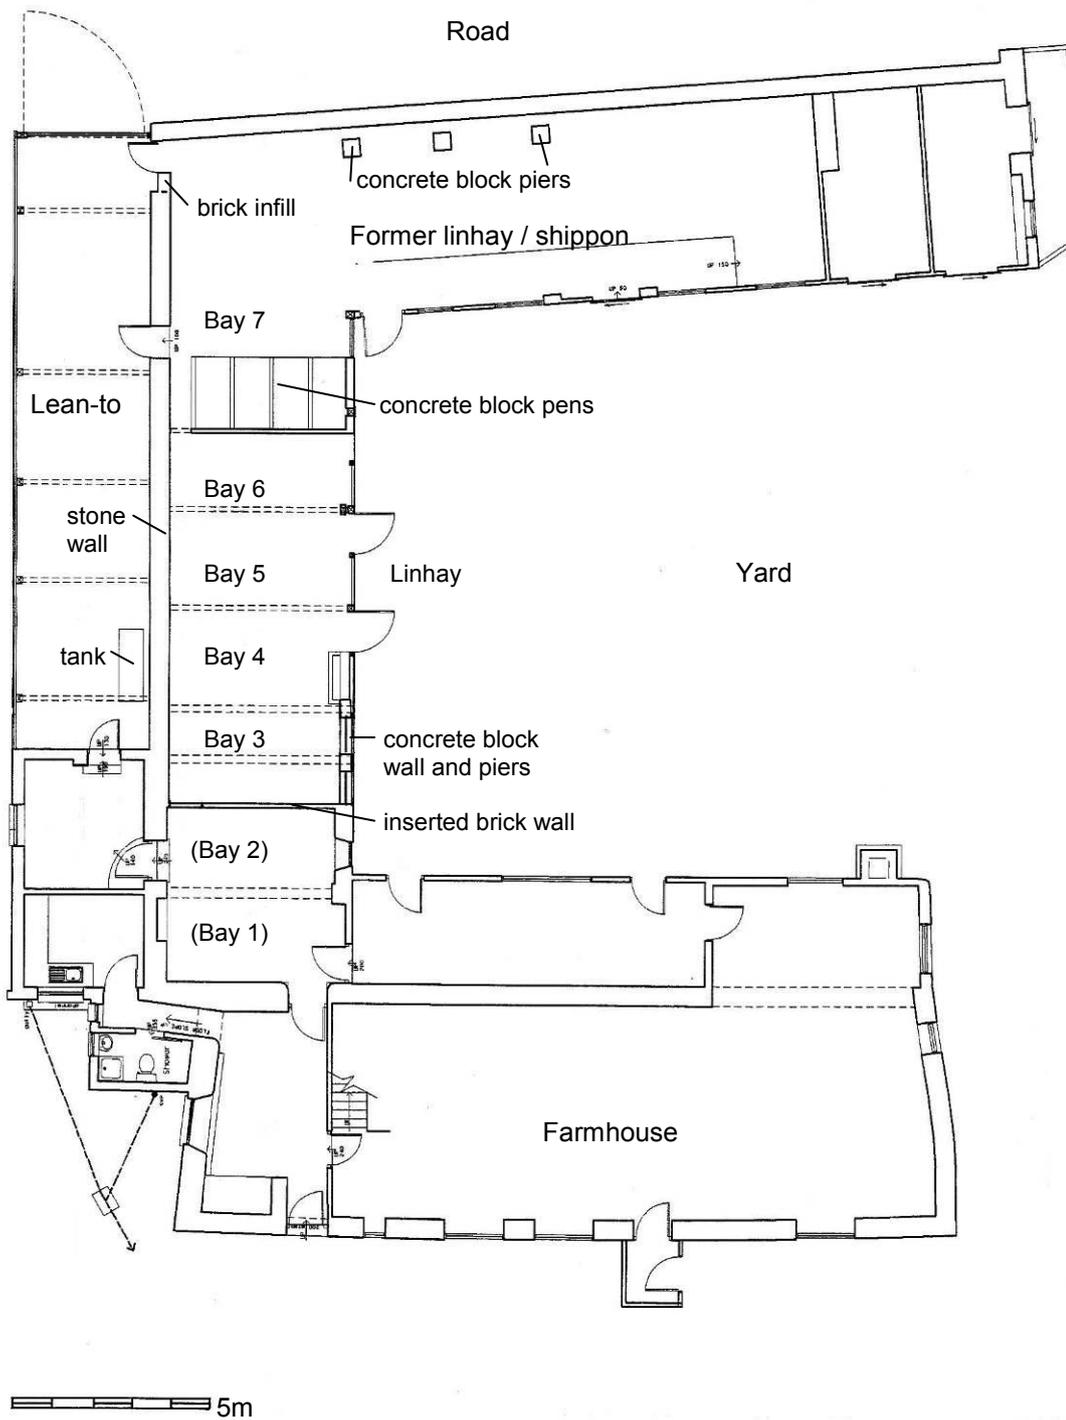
Woodhayes Farm, Clyst Hydon. Ground plan of linhay
